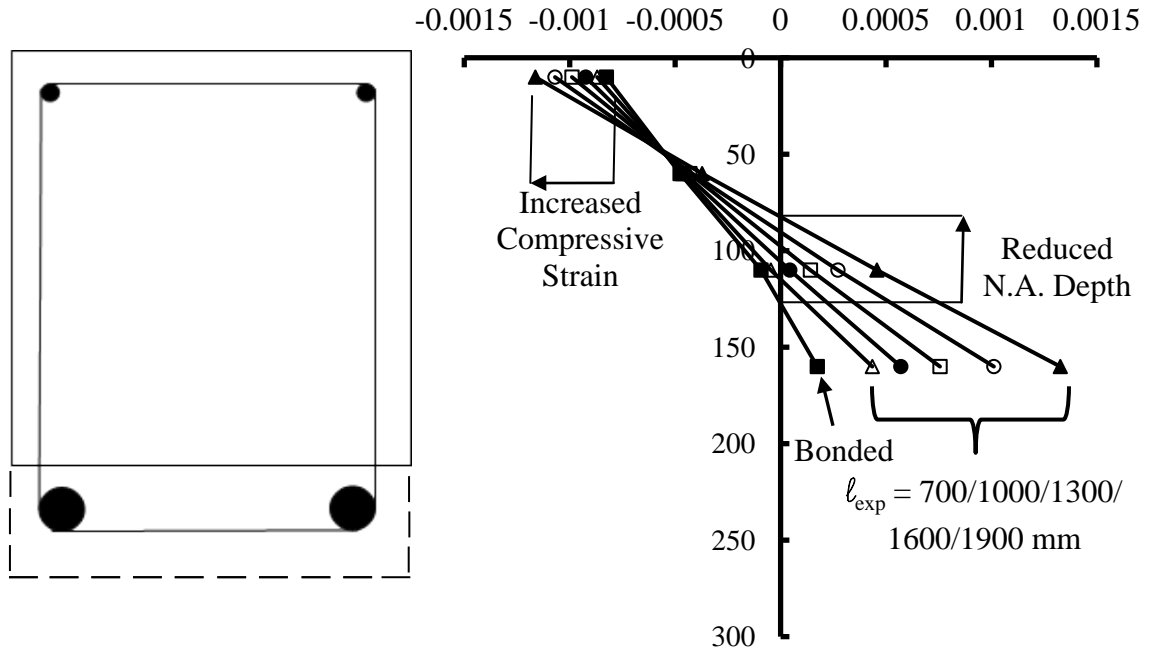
Change in Longitudinal Strains in Concrete Section on Exposure of Flexural Reinforcement (Redrawn from Cairns and Zhao 1993).
